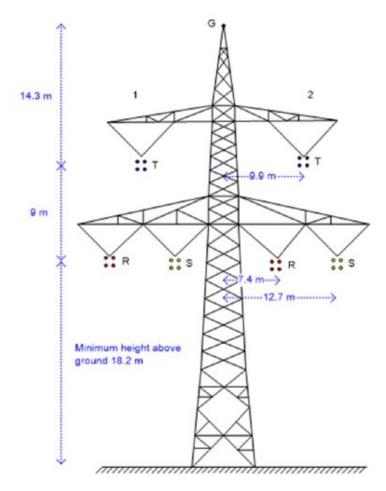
Typical Danube AC 400 kV Tower Setup
